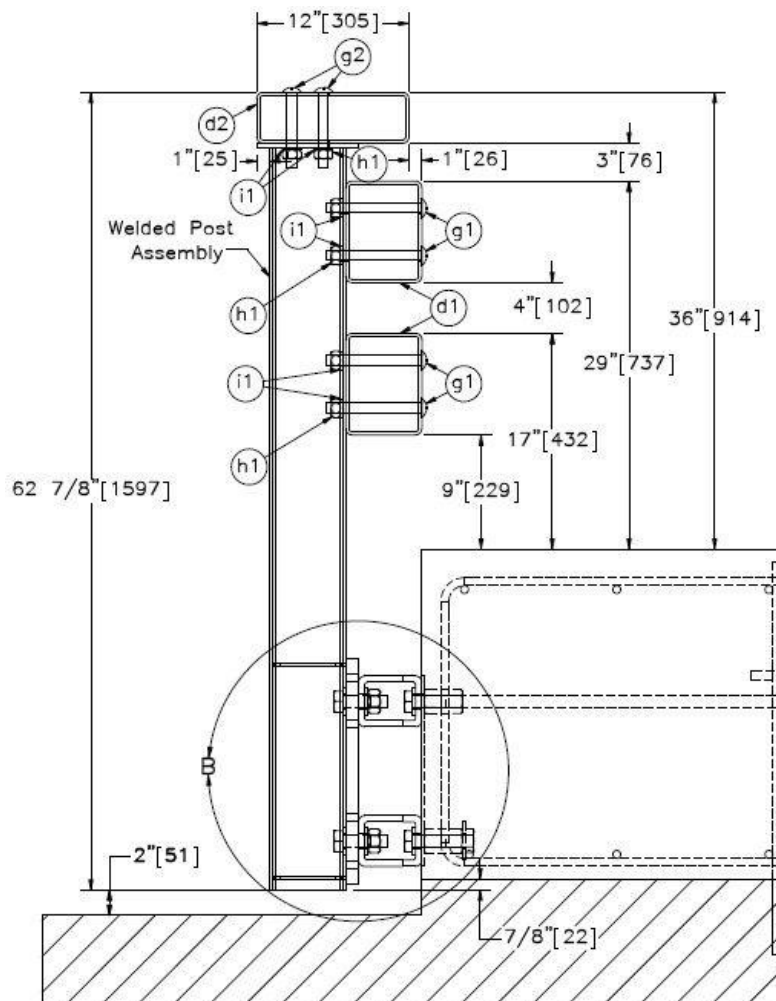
36-in. Tall Illinois-Ohio Steel Bridge Rail Drawing [29-32]
